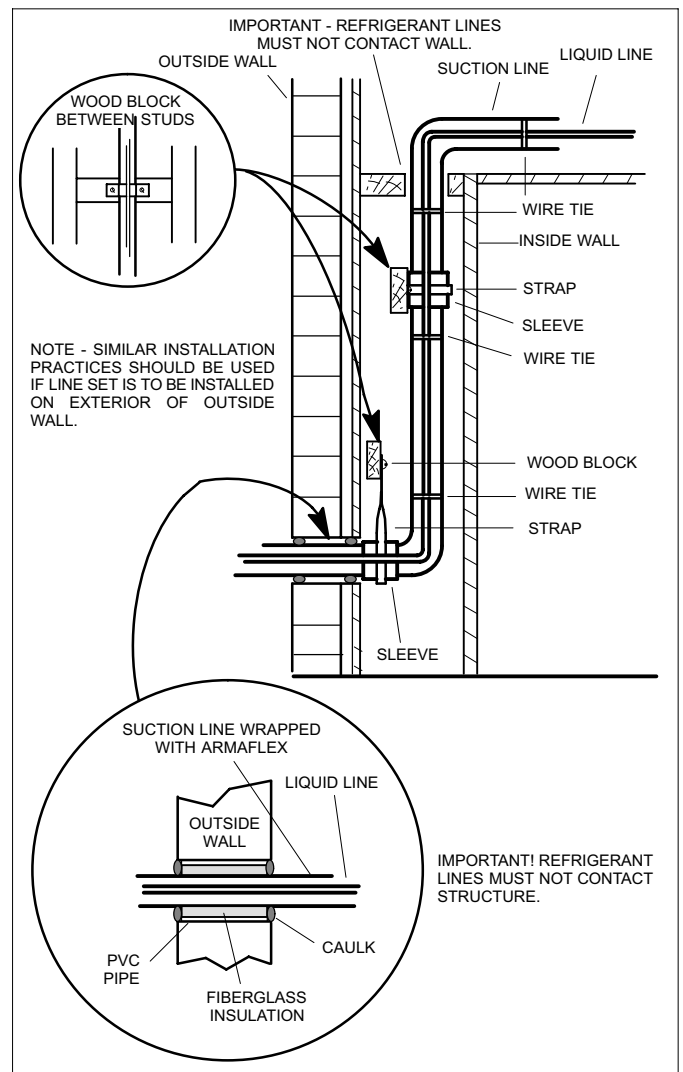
Refrigerant Line Set: Installing Vertical Runs (New Construction Shown)
